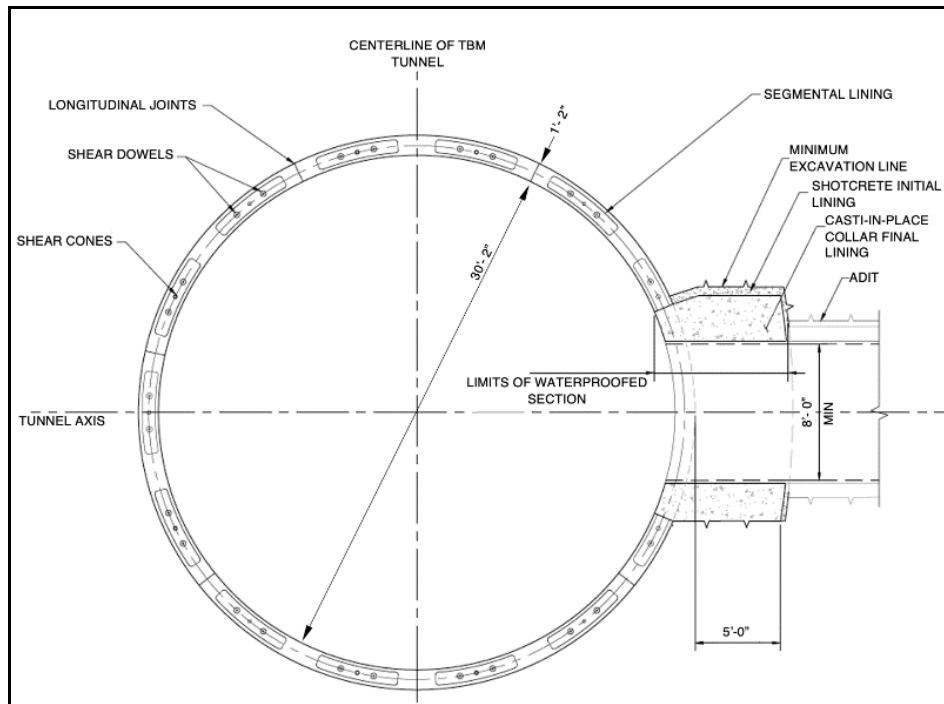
TBM adit opening ring cut with final cast-in-place concrete collar and adit.
